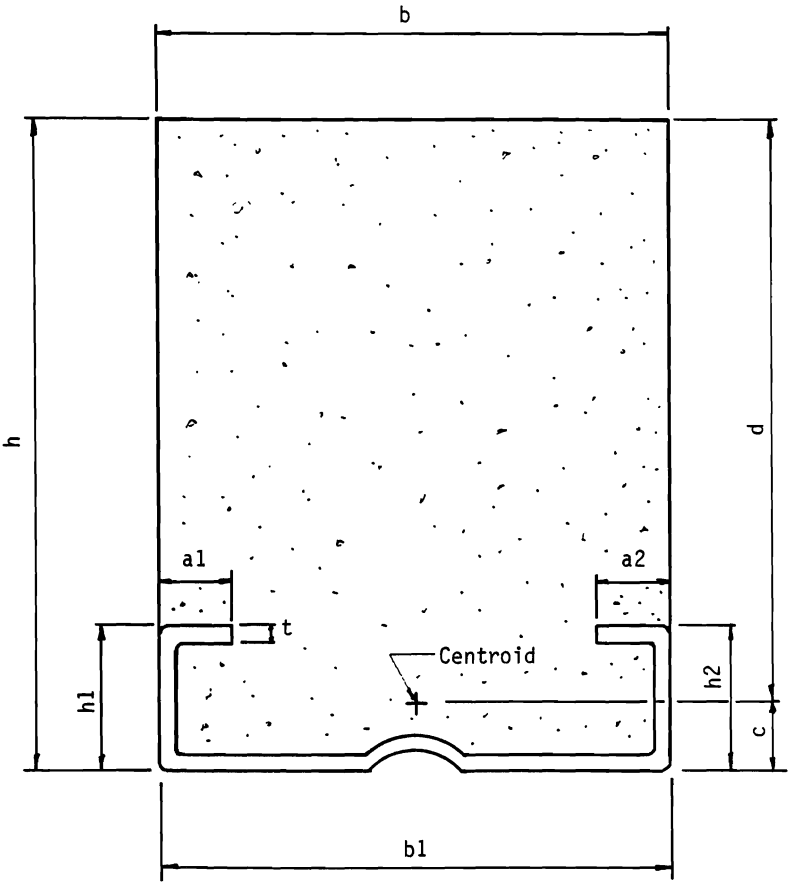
TYPICAL COMPOSITE BEAM SECTIONS
